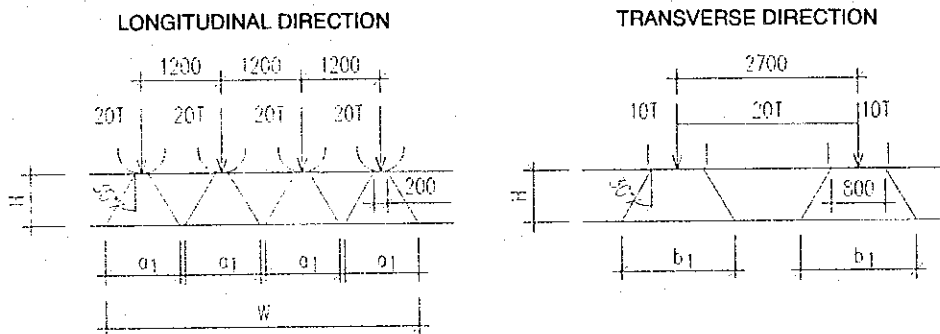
Vietnamese HK-80 loading for Culvert Design
